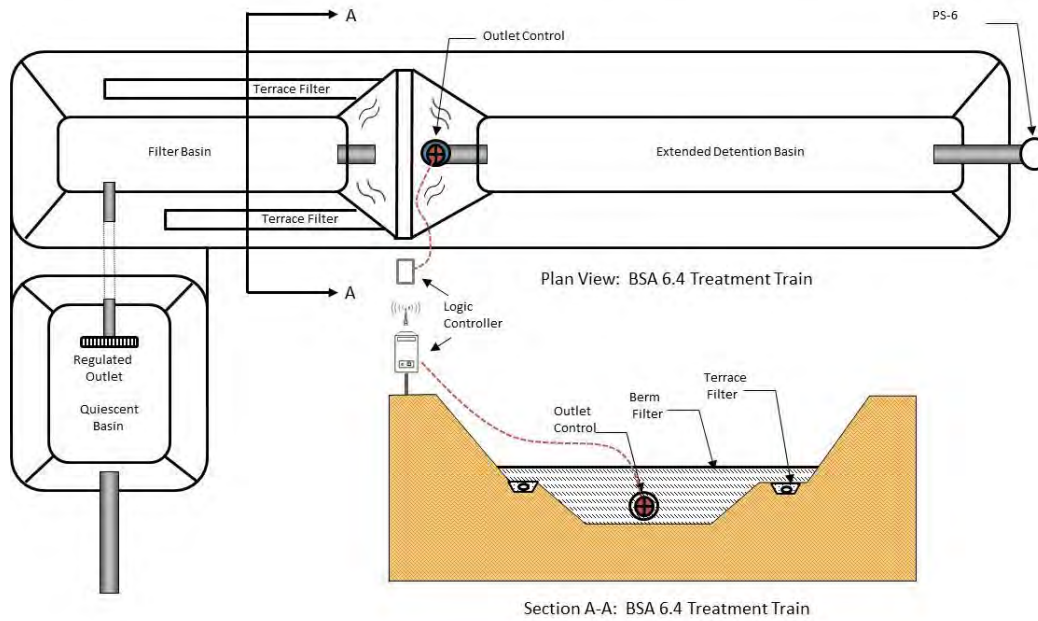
Plan and Section View of Proposed Water Quality Retrofits to EQB and EDB
